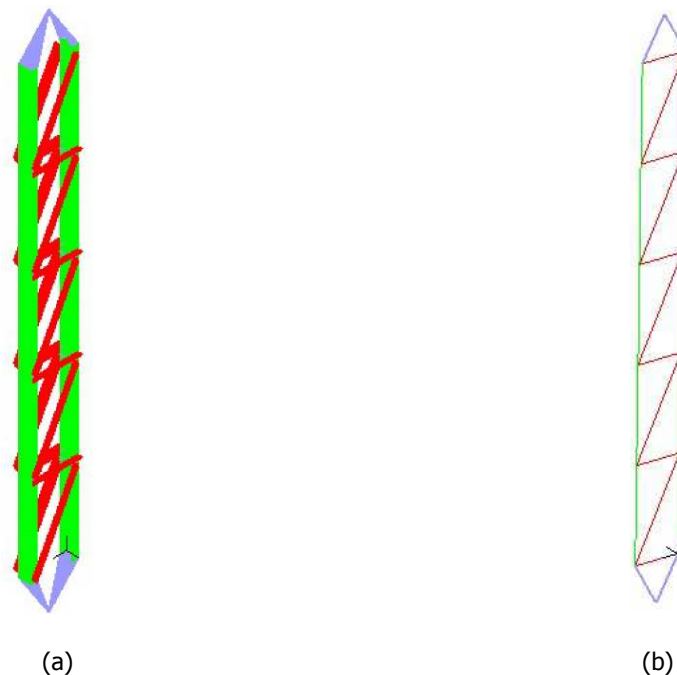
(a) Shell element and (b) beam element numerical models for typical laced member of Group 1
